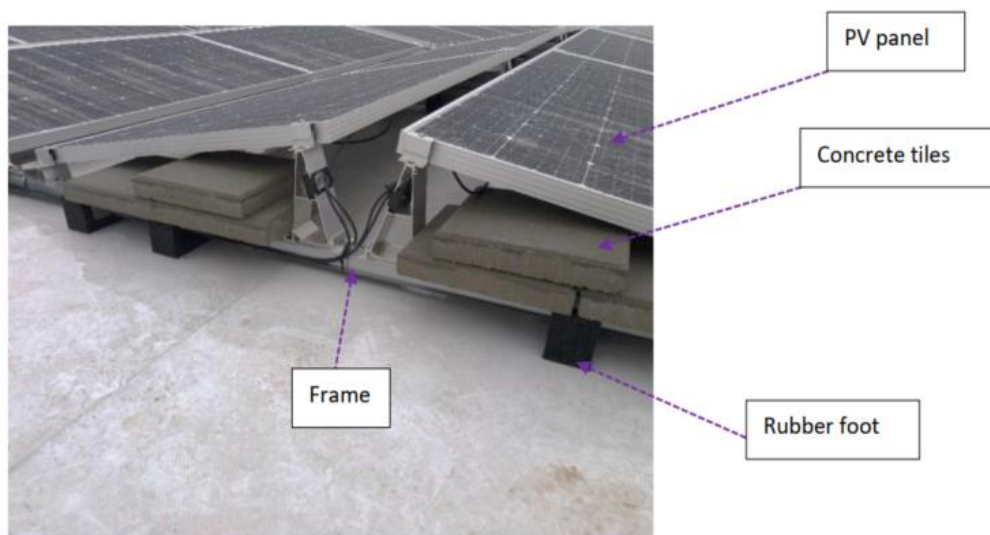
Placement of PV panel on the roof (ASK Romein, 2020).
